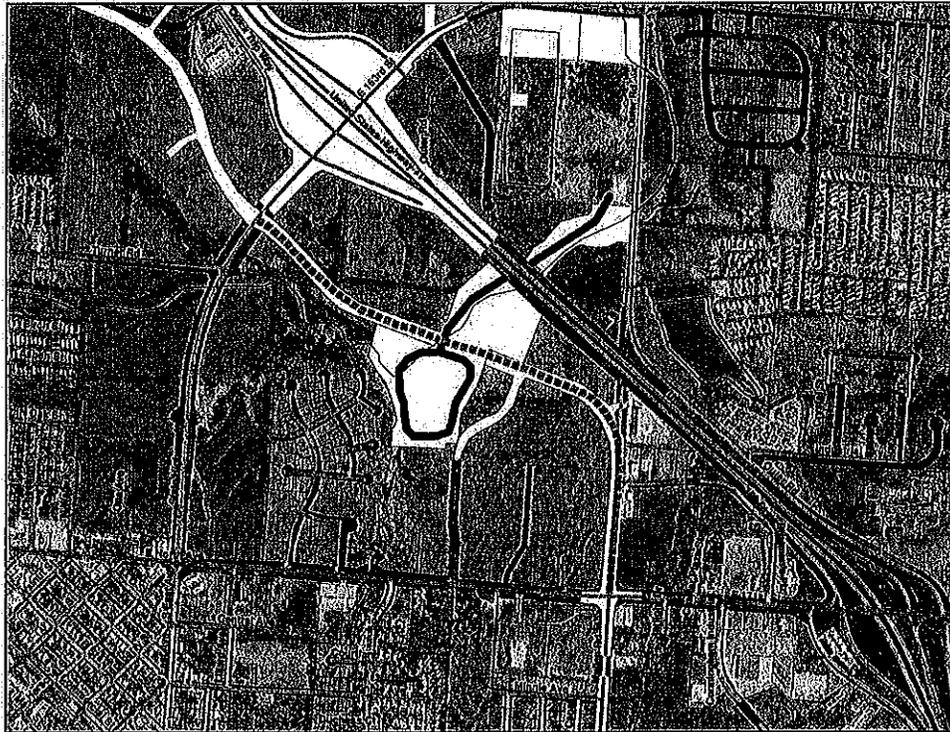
Markey Parkway, US71 Underpass and Wallace Extension
